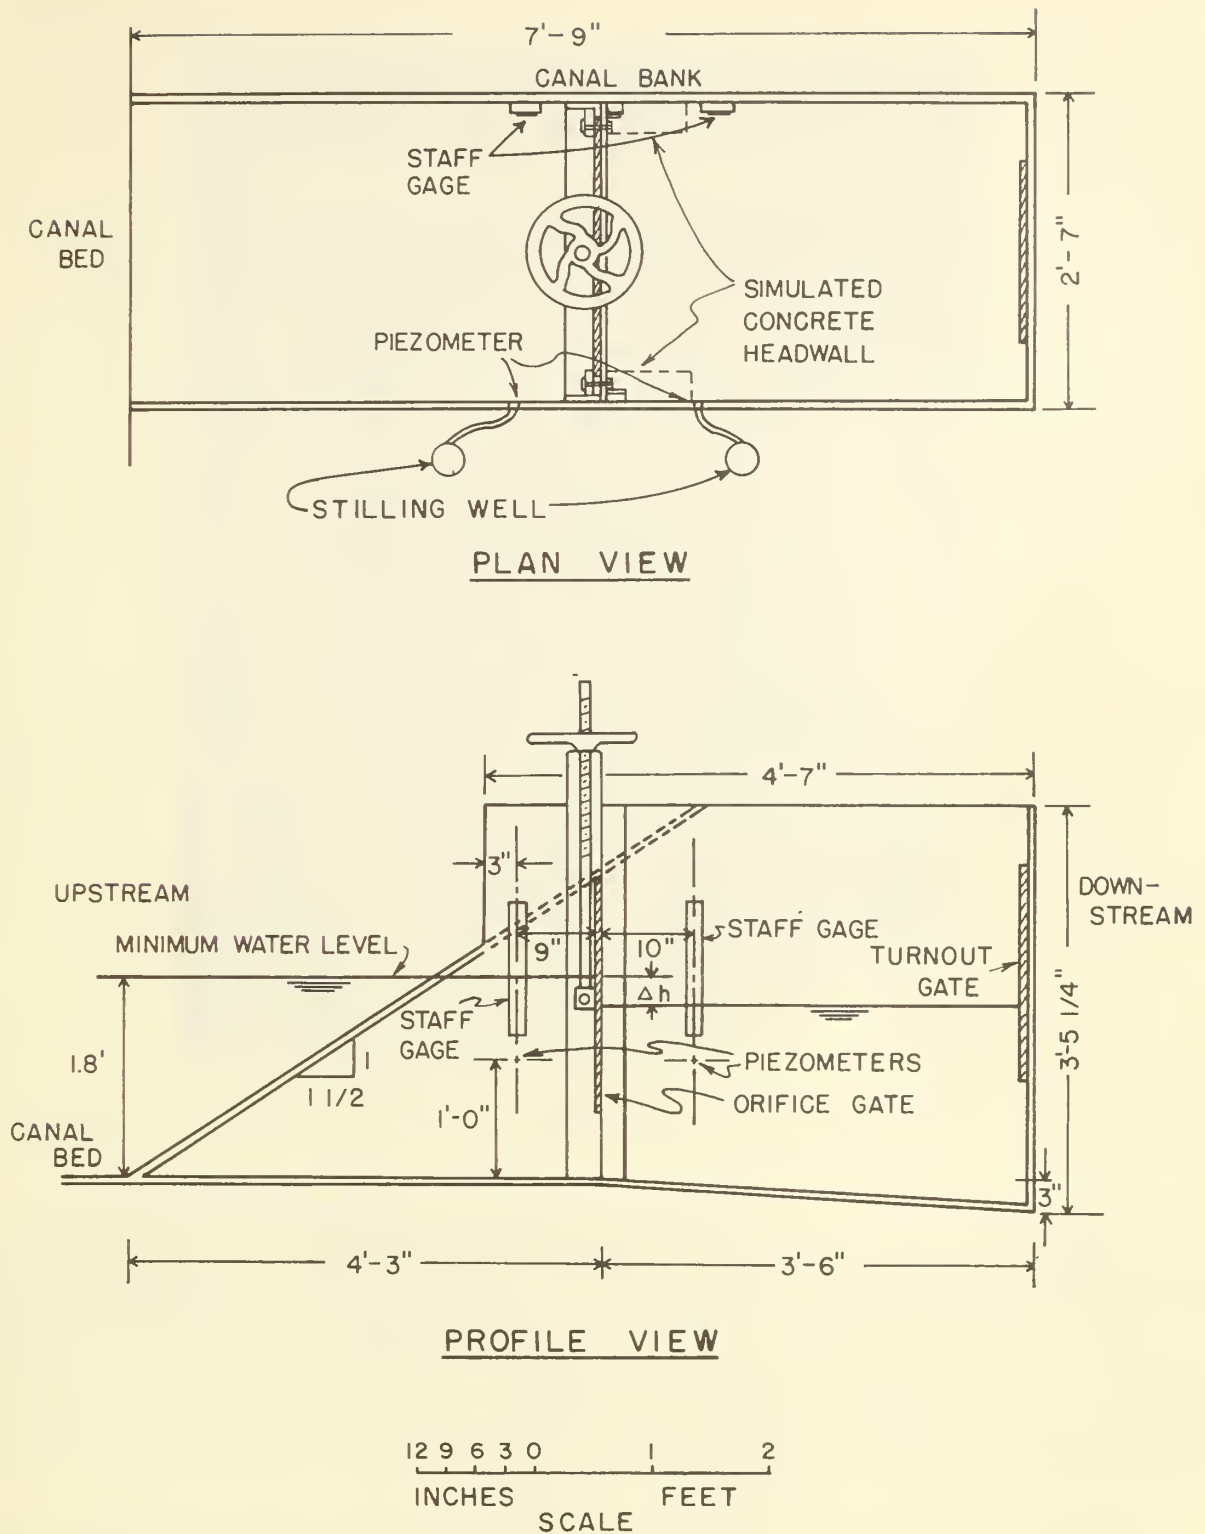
Line drawings of Riverton constant-head-orifice turnout with horizontal approach.
